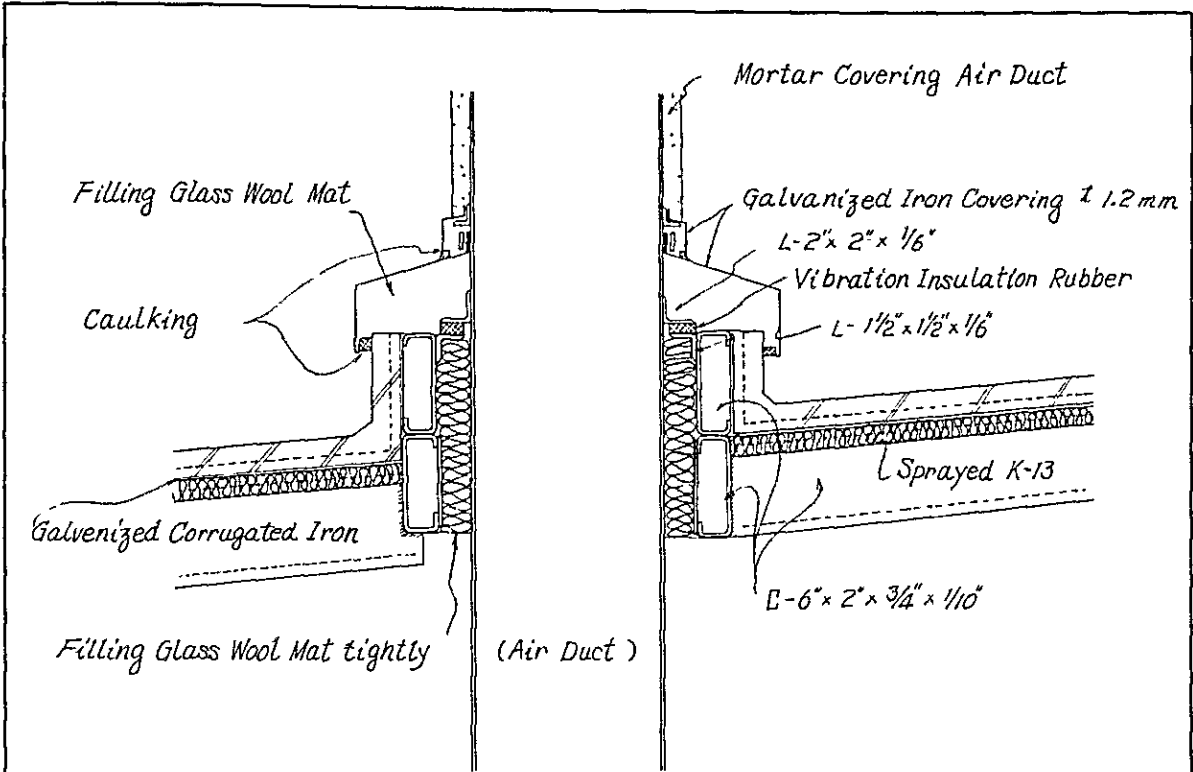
Sound & Vibration Insulation Method of Air-Duct passing through the roof structure
